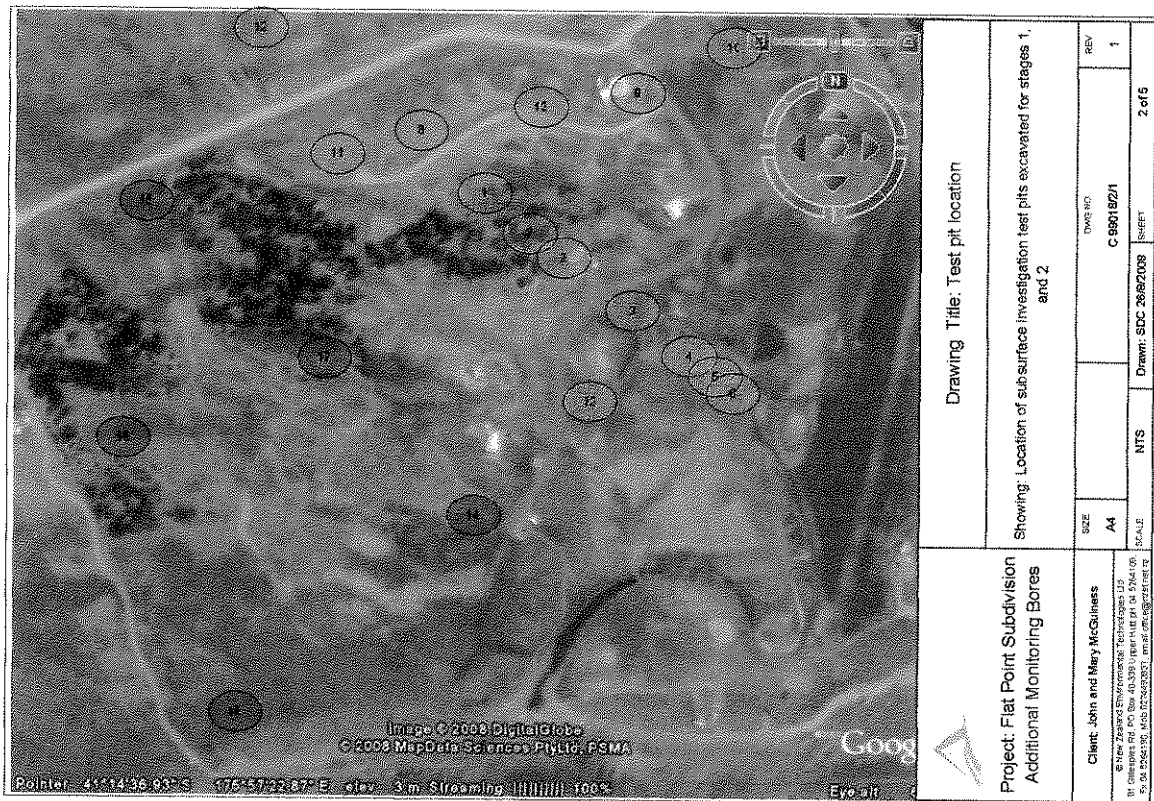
Test pit location, (stage 1 (green) and 2 (purple))
